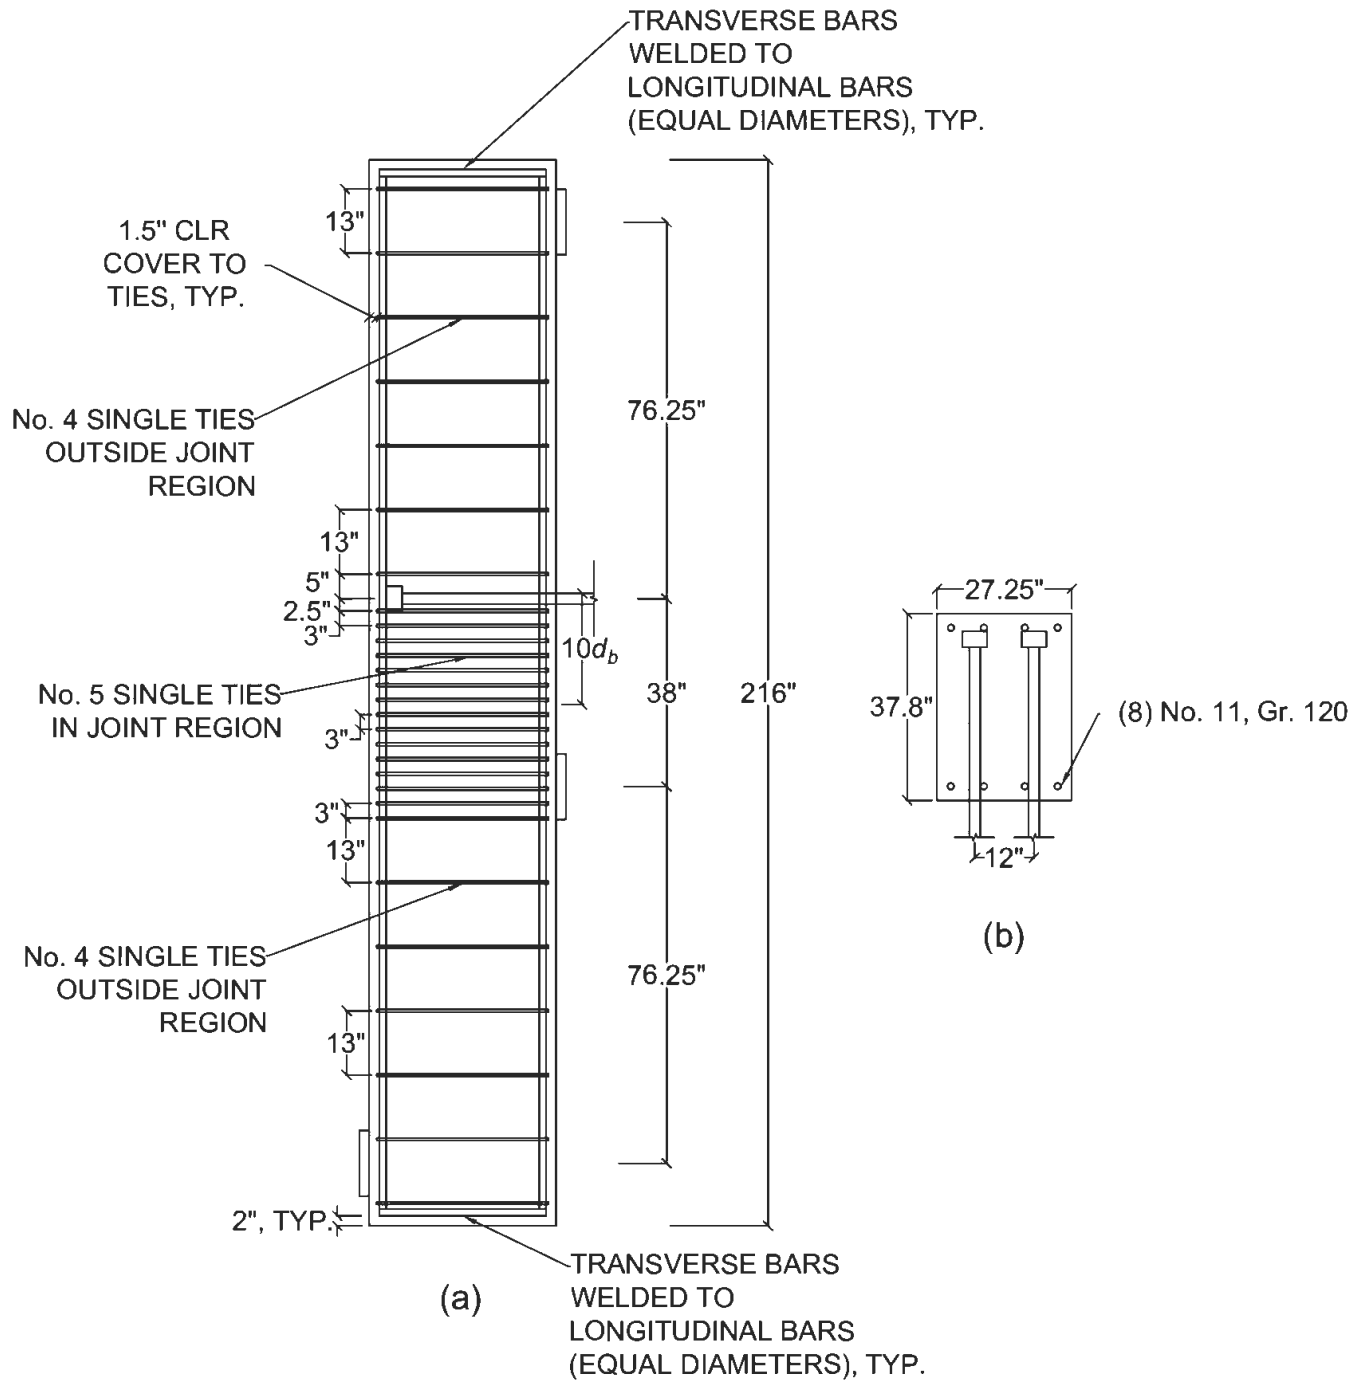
Details of reinforcement layout for No. 18 headed bar specimen 18-5: (a) elevation, (b) cross-section
